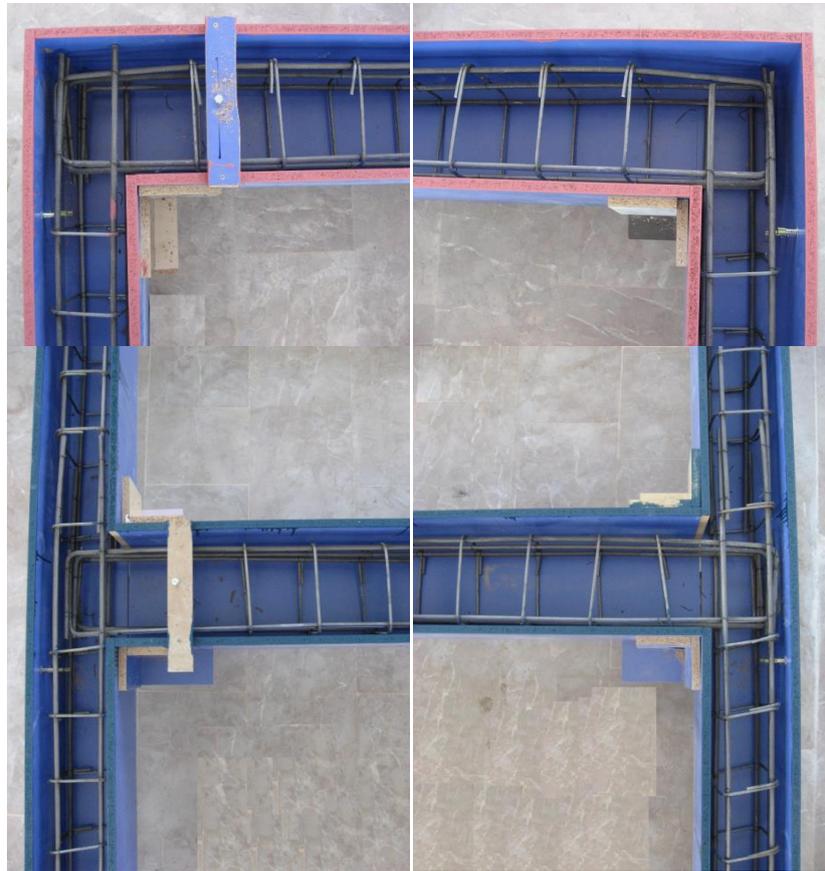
Reinforcement details of the specimen (Korkmaz *et al.* 2010)
